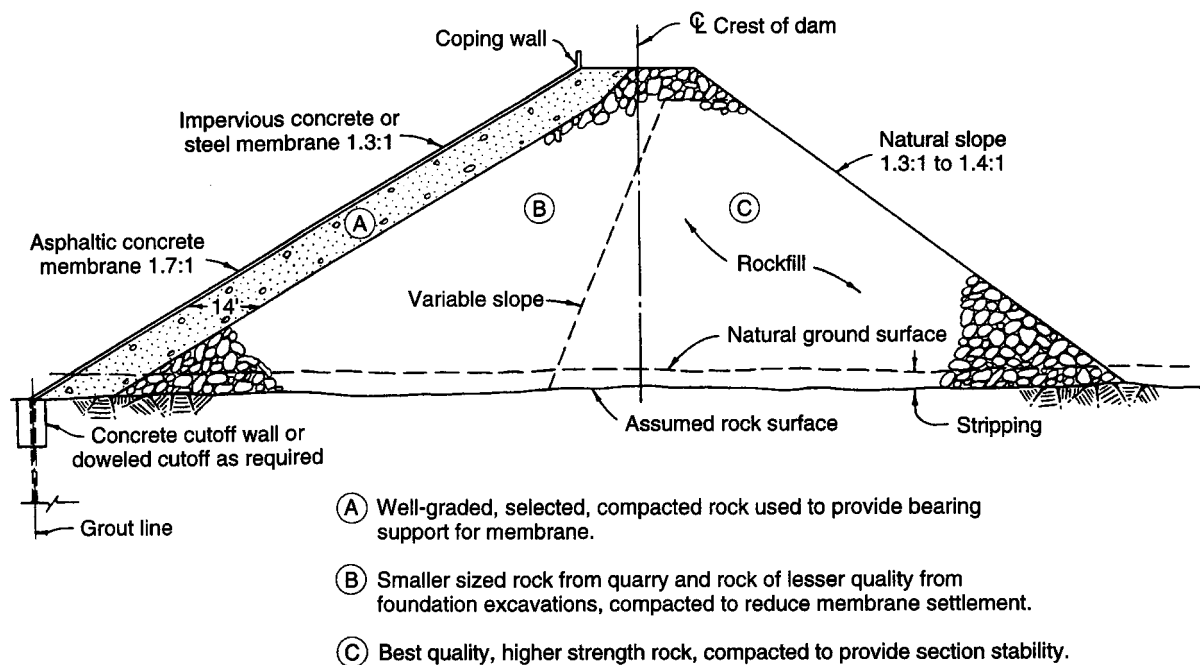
Typical maximum section of a decked rockfill dam (from U.S. Bureau of Reclamation (1987)).
